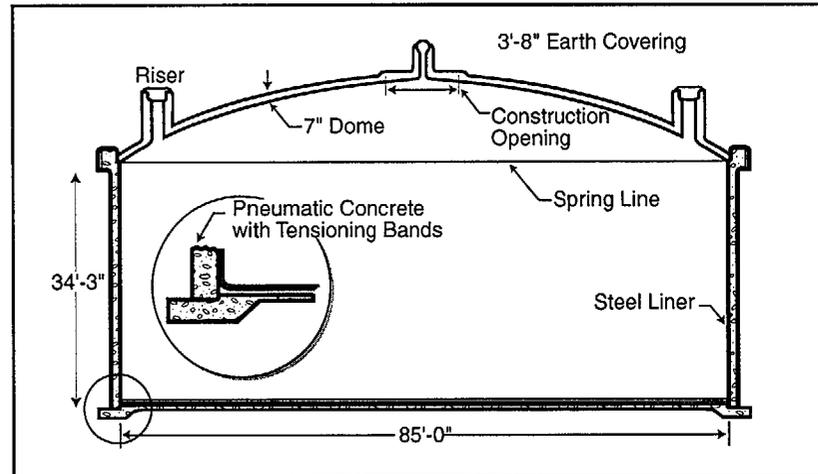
C. Uncooled Waste Storage Tank, Type IV (Prestressed concrete walls, 1,300,000 gallons)
